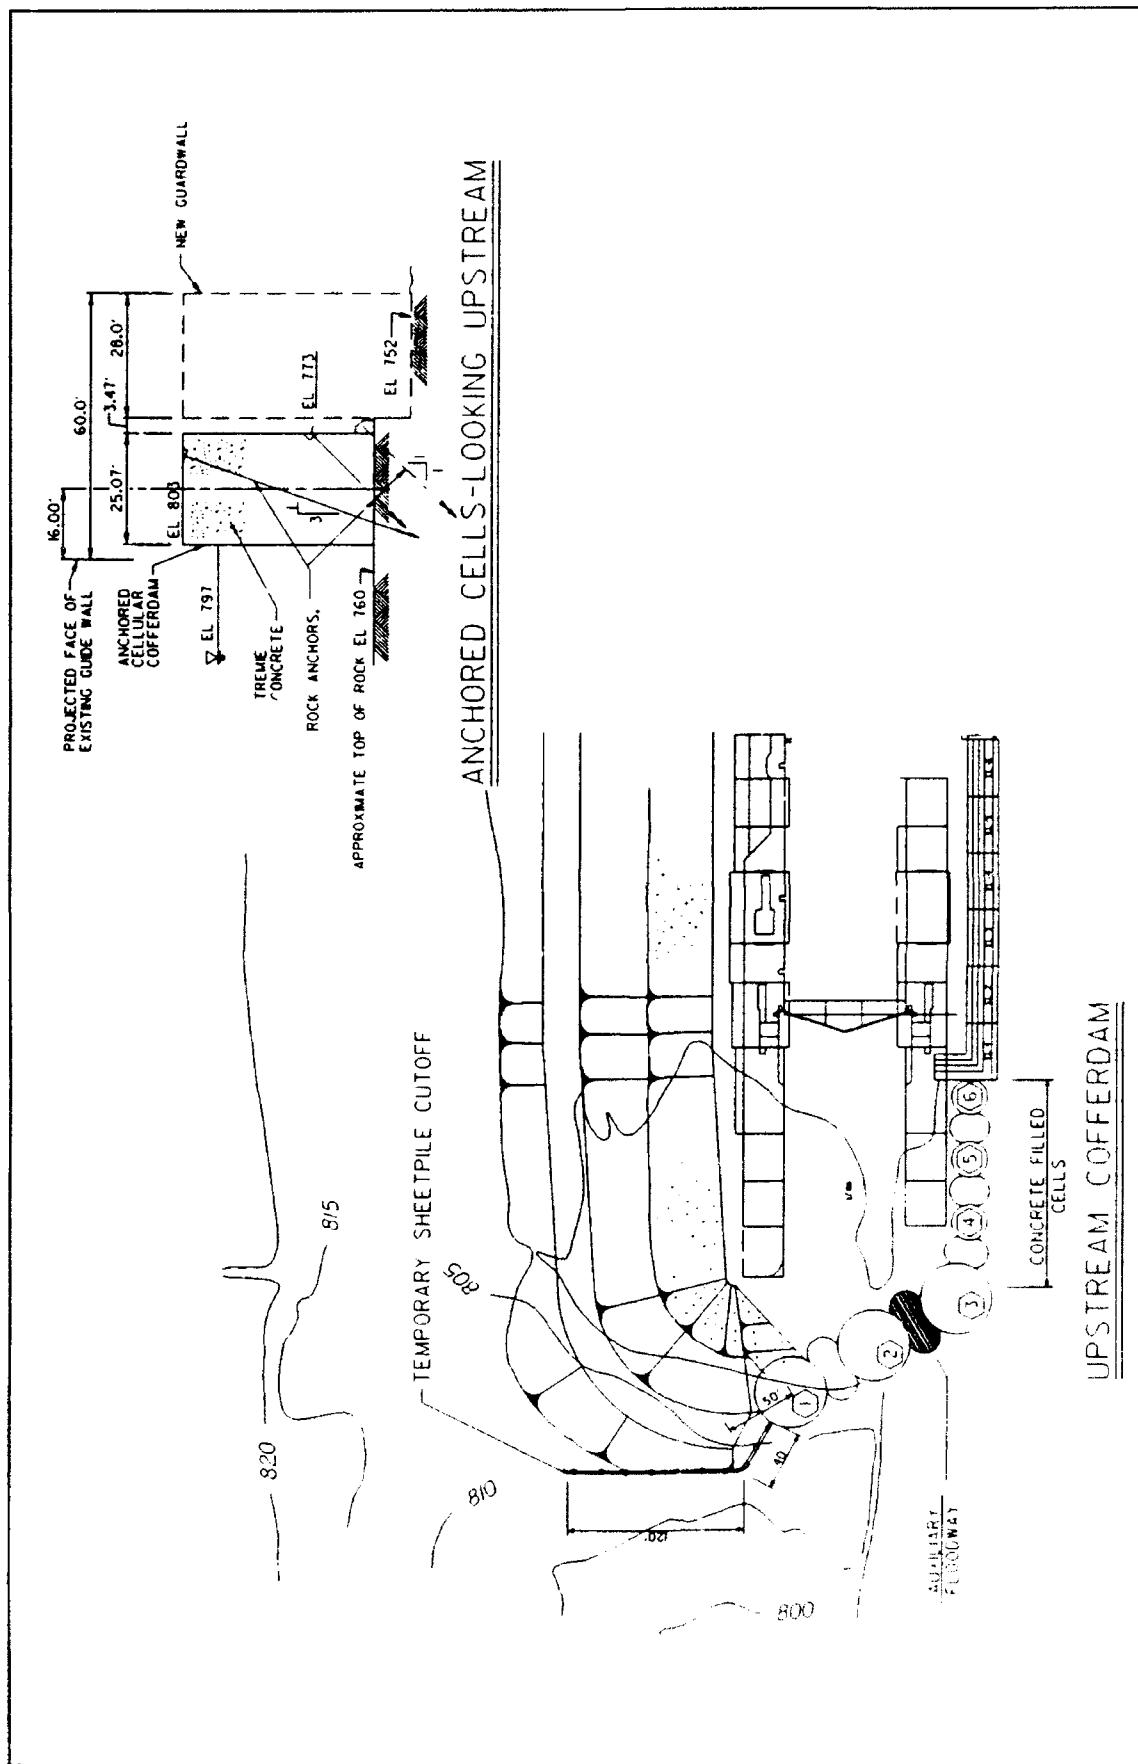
Point Marion Lock cofferdam anchored concrete-filled cells
